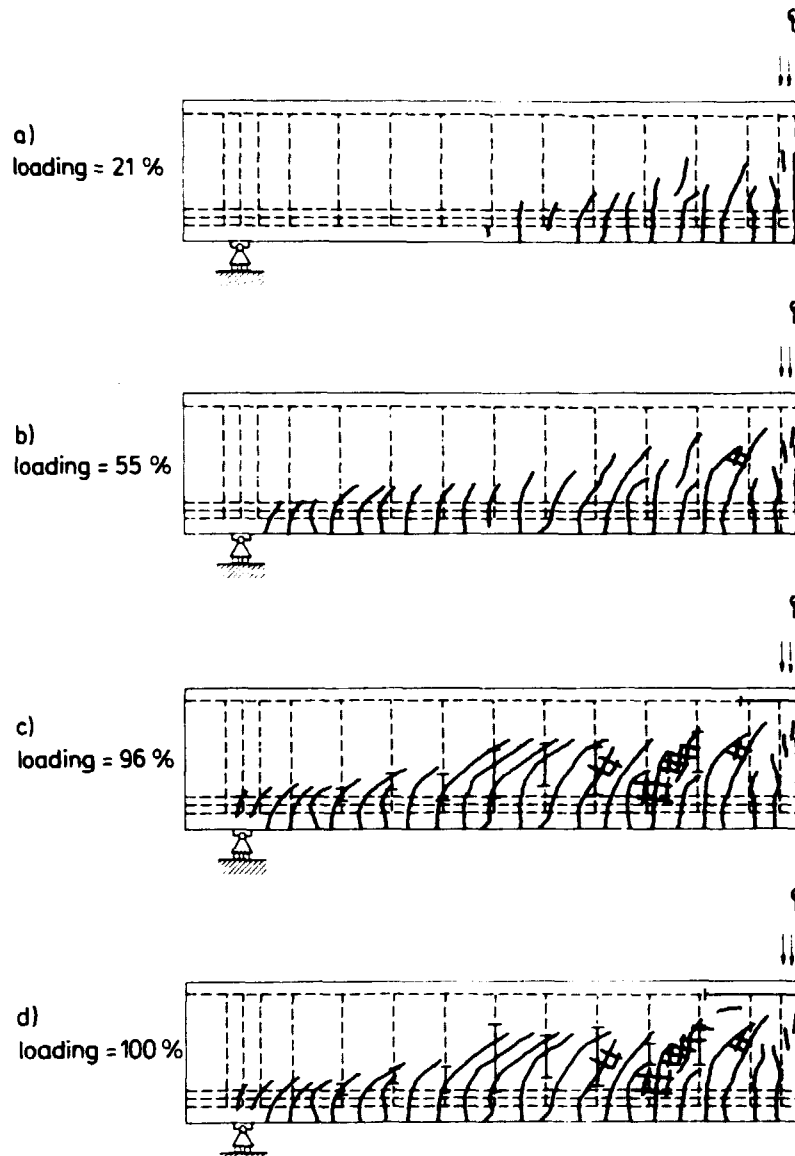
Calculated crack development of the A-2 beam.
